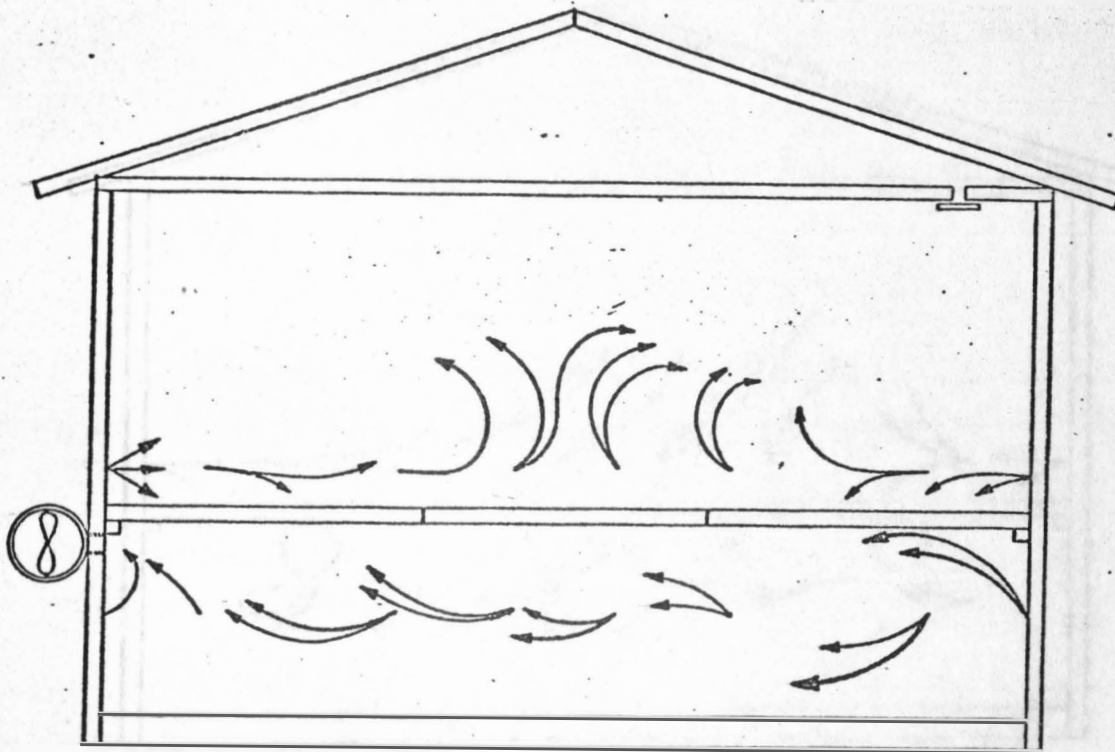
Air flow patterns for outside wall pit ventilator system, side baffle, center location.
